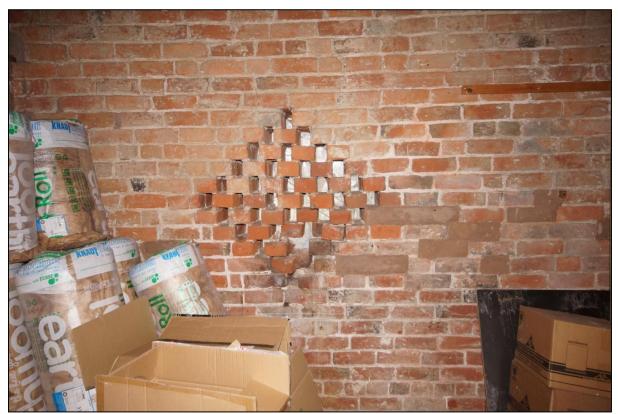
Honeycomb ventilation within the north wall of Building 19, viewed looking north.
